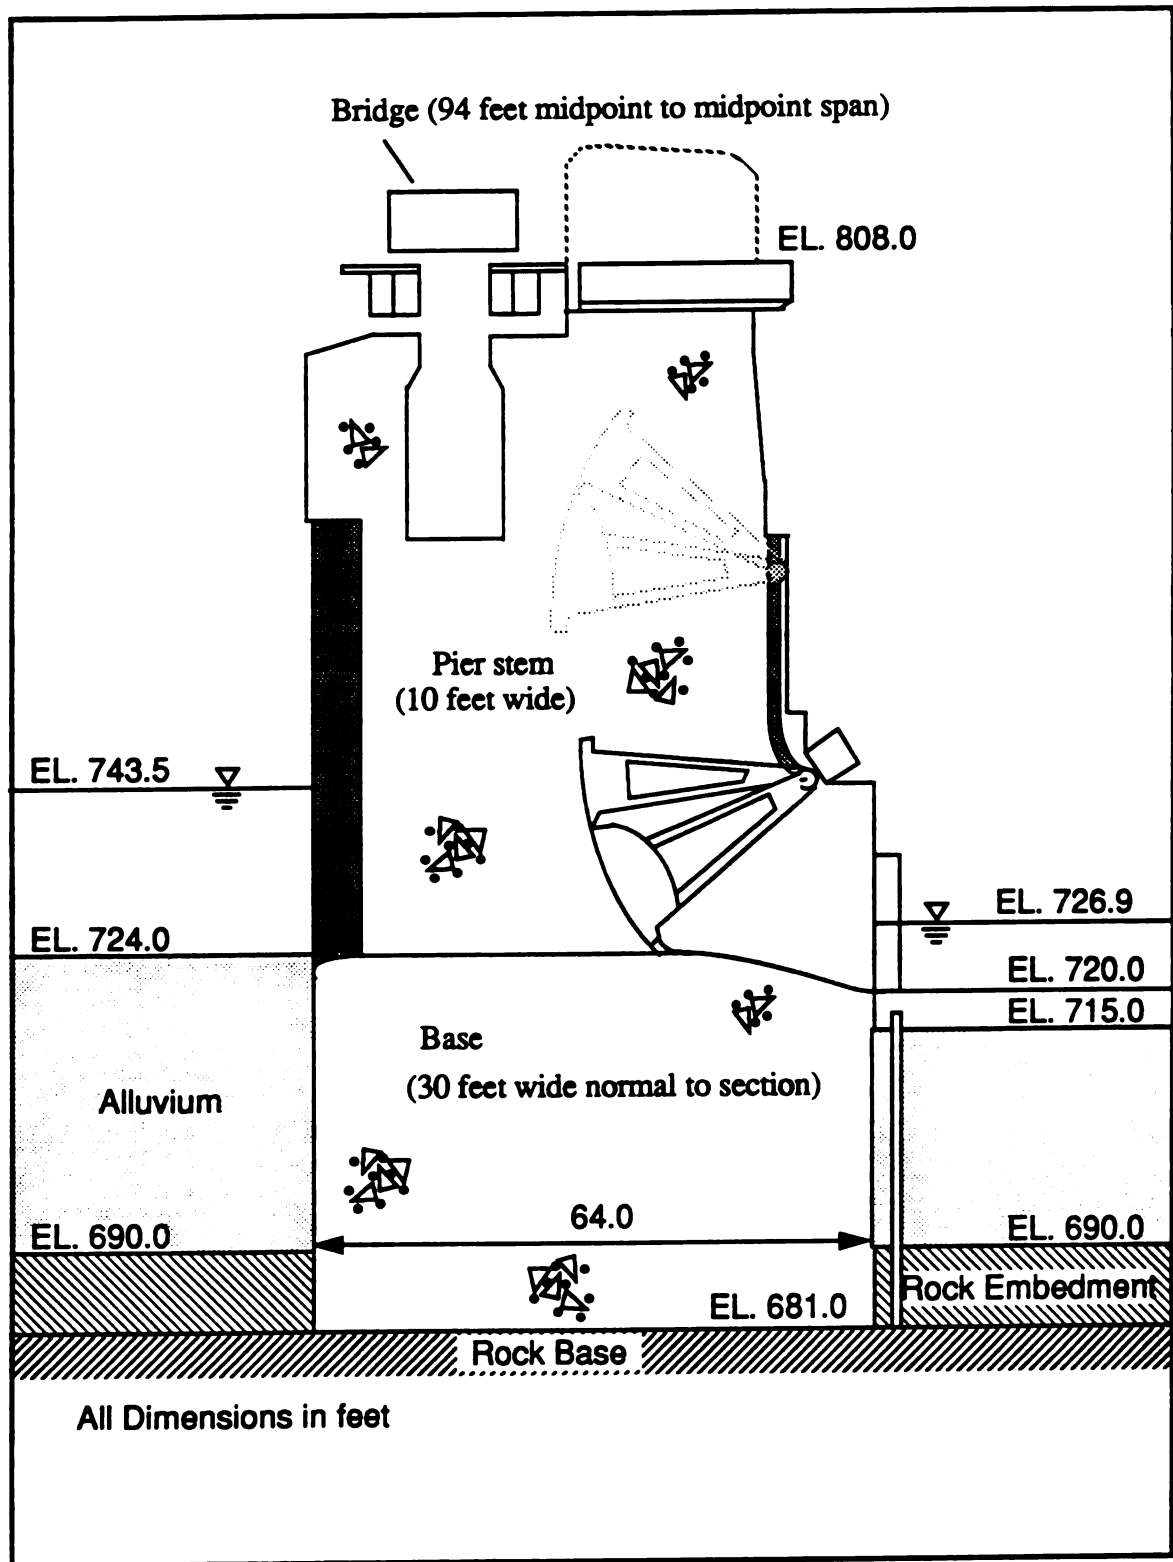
Locks and Dam No. 4, Dam Pier 3, Cross-Section
